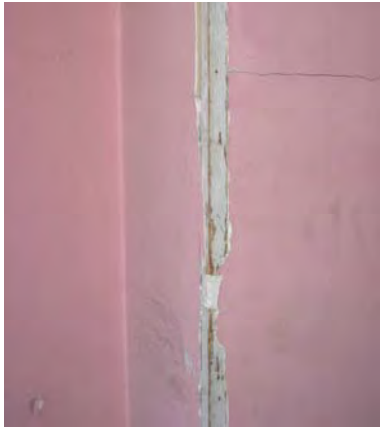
Wood ledge strip at south wall. (Photo: BBB, 2007)
